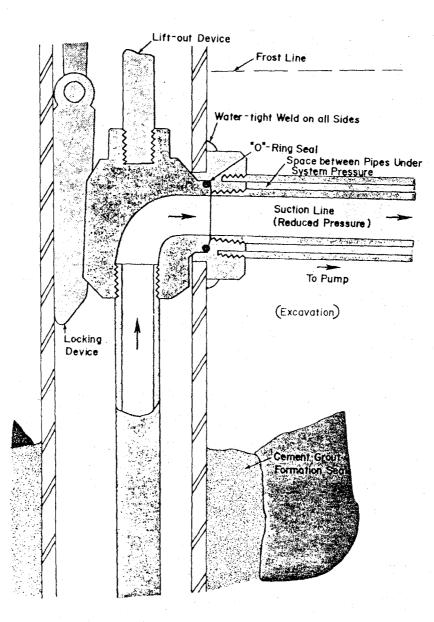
PITLESS UNIT WITH CONCENTRIC EXTERNAL PIPING FOR JET PUMP INSTALLATION
